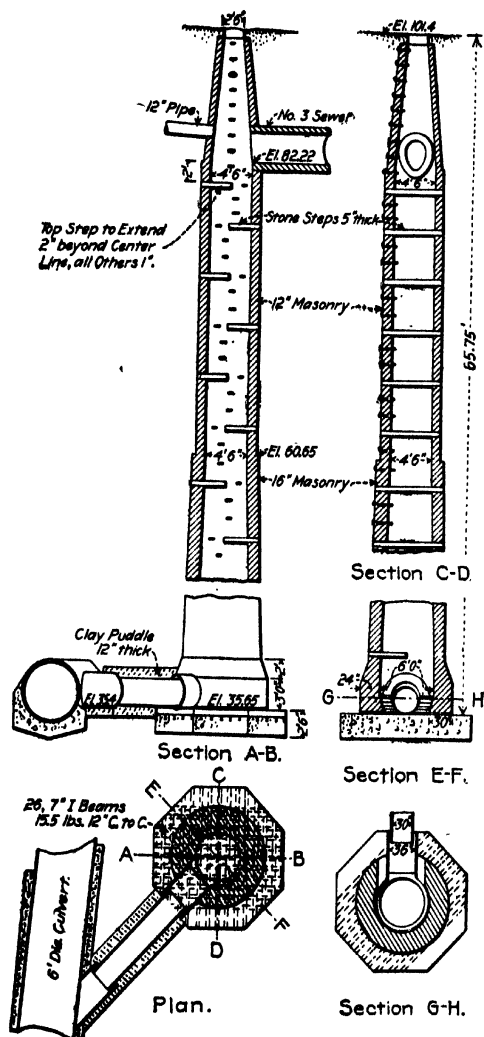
Wellhole, Petrie Street sewer, Cleveland.
